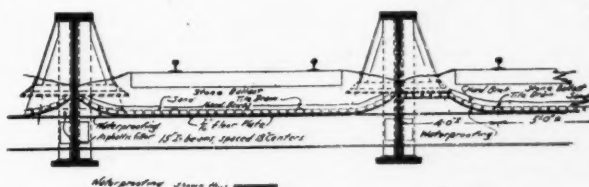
C. R. R. OF N. J. METHOD OF WATERPROOFING BRIDGE FLOORS.
